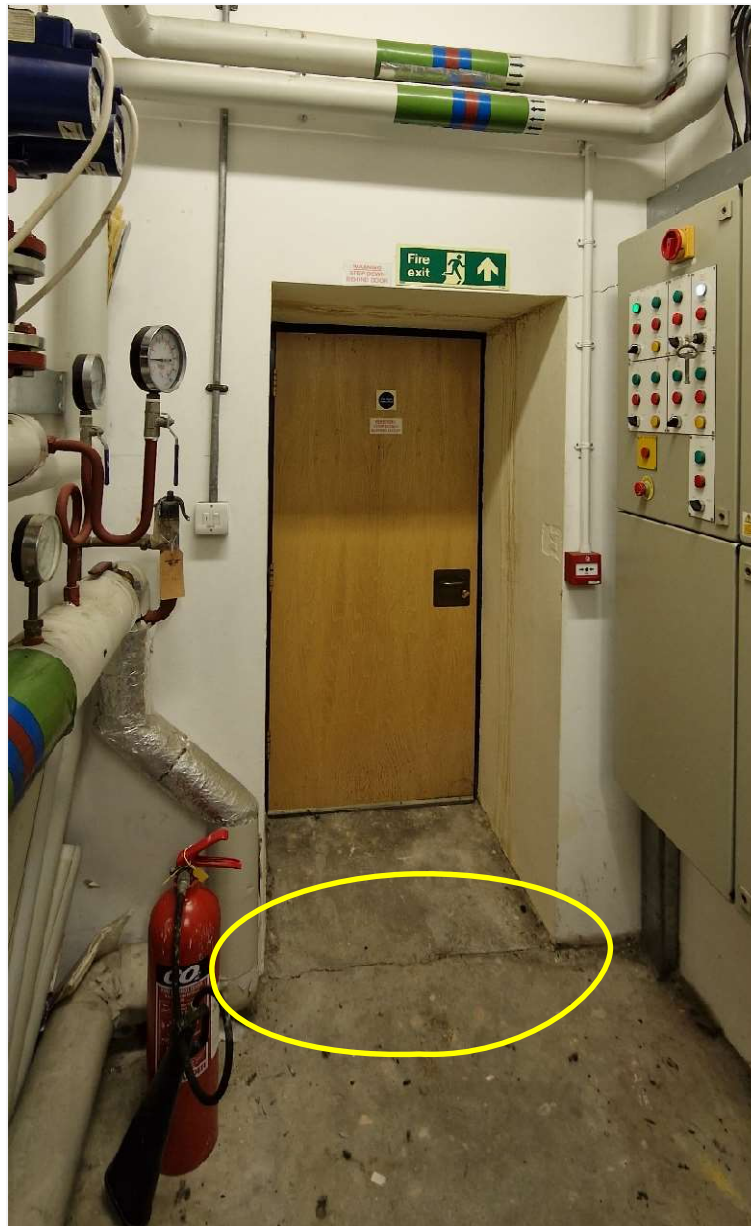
Photograph of first floor plant room showing cracked floor
